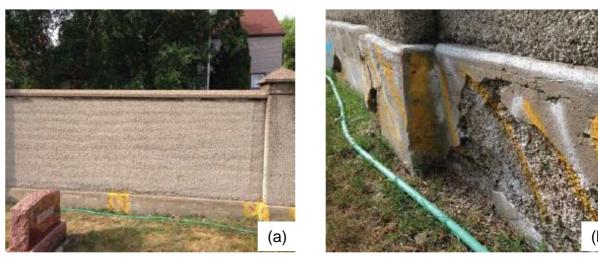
Perimeter walls at St. Boniface Cemetery, Chicago, IL: (a) a general view; and (b) close-up of the deterioration of the 1/8 in. (3 mm) thick mortar coating on the porous concrete foundation
